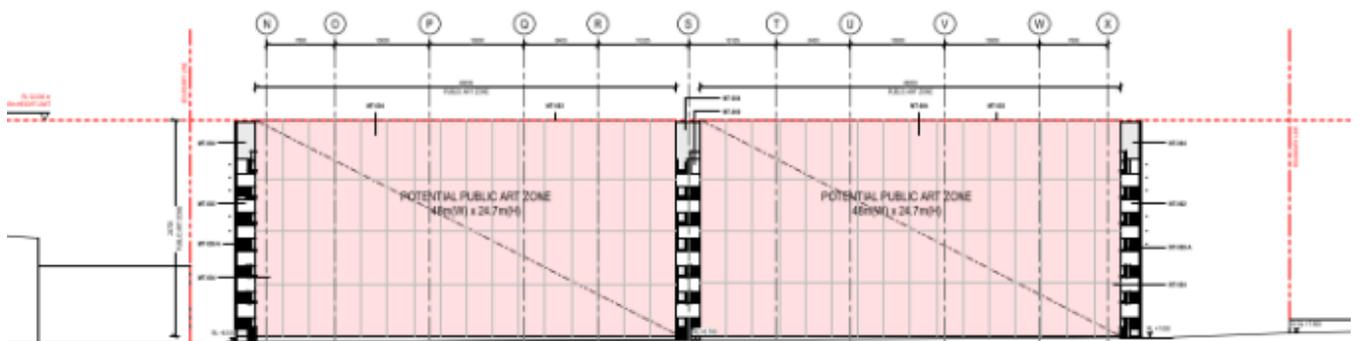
Proposed southern (Gardeners Road frontage) elevation including future public art zones
